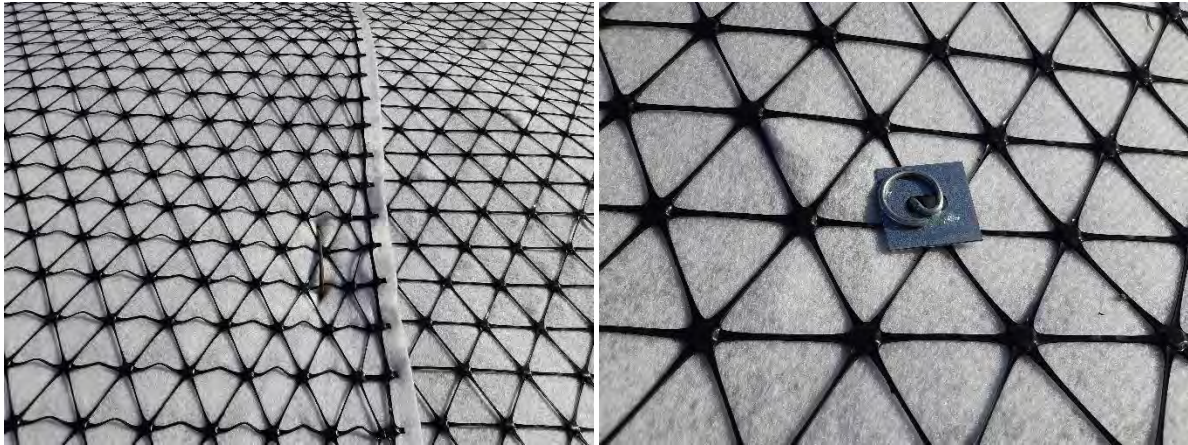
Left: long U-pin; right: Grippe Terra-Lock pins with washer. The screw is not fully tightened
